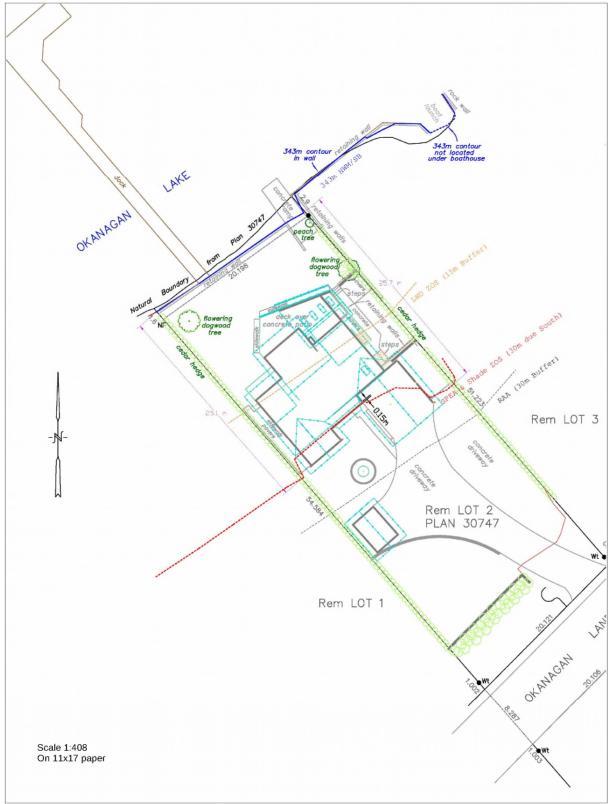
B: Site plan with existing structures (grey), existing roof-line (light blue), existing trees and hedge and RAPR determined SPEA (red dashed) – Aerial Image removed for clarity.
